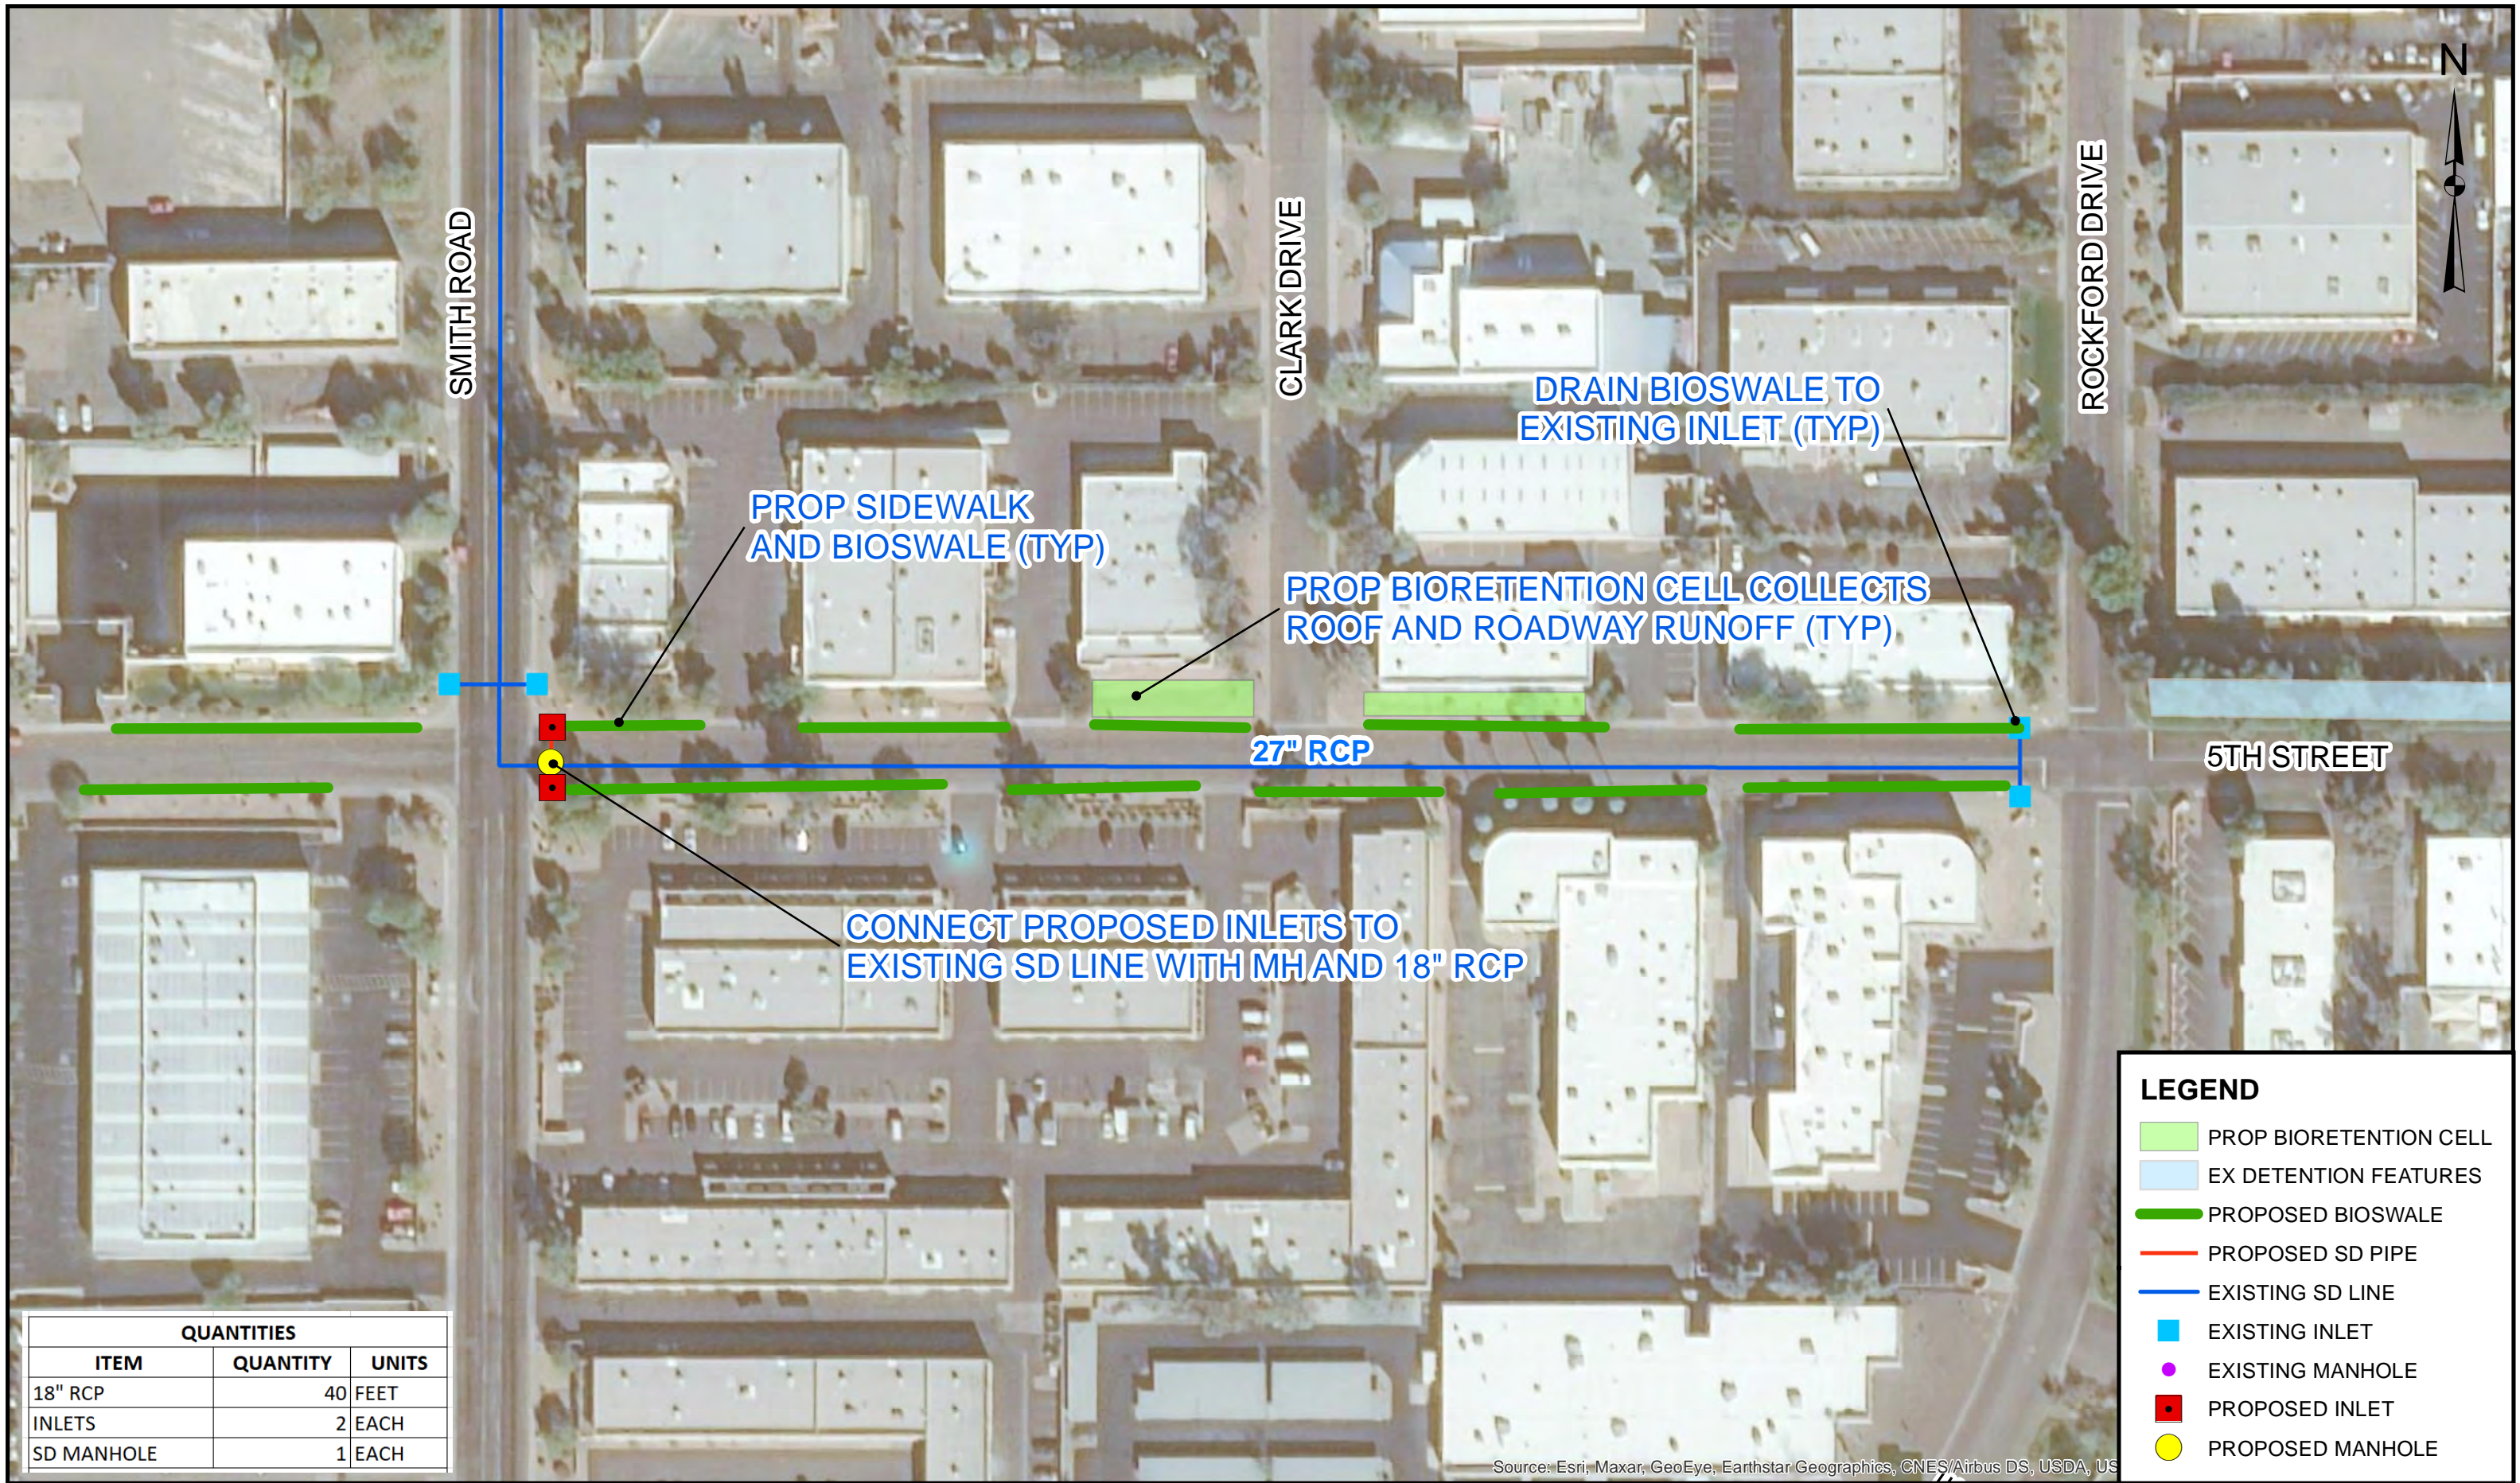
A - PROPOSED DRAINAGE AND ROADWAY IMPROVEMENTS OVERVIEW
